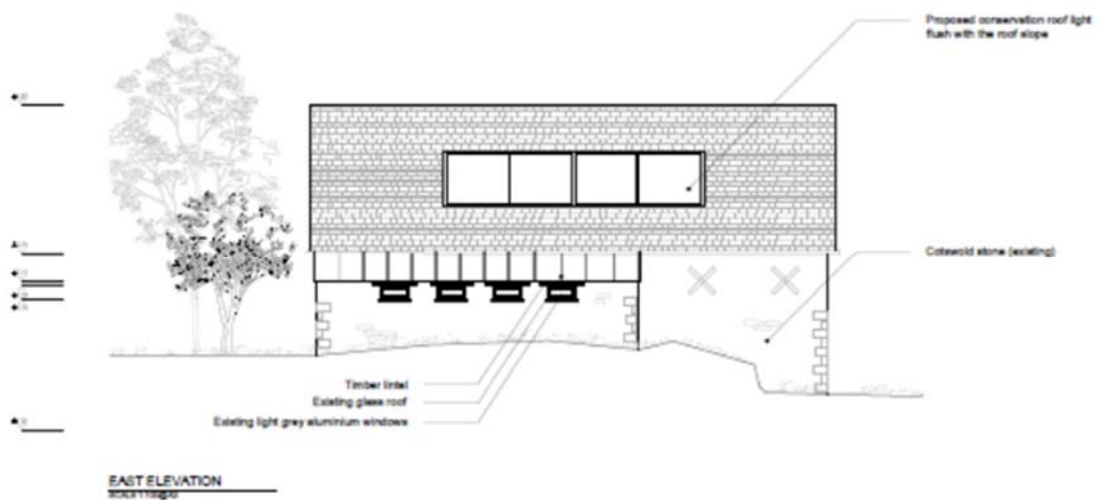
East elevation of outbuilding (see drawing 501 L 02 14 REV B OUTBUILDING PROPOSED ELEVATIONS)
